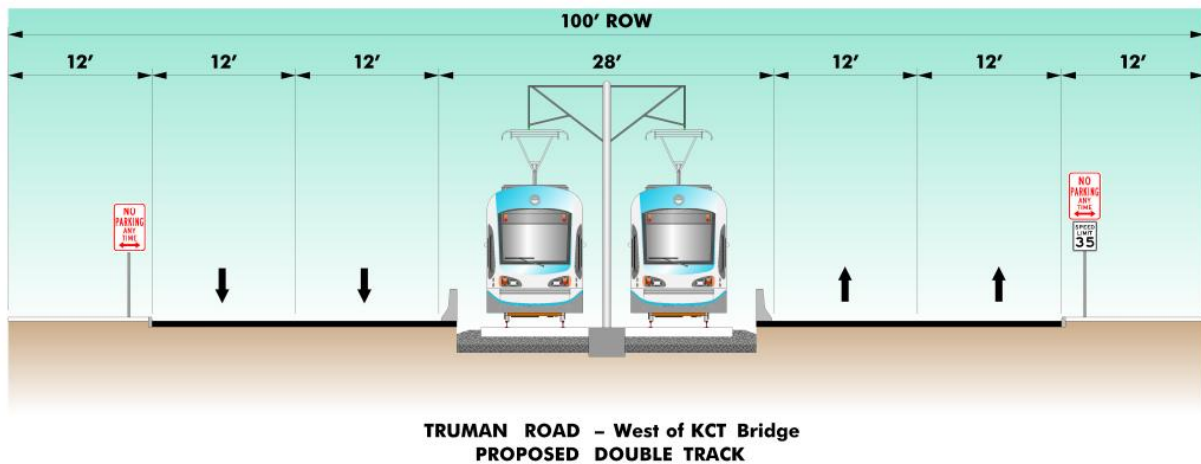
Enhanced Streetcar Typical Section - Truman Road, West of KCT Bridge
